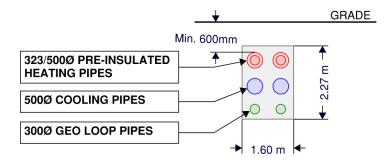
Proposed 3 x 2 DPS Installation on Joseph Street
